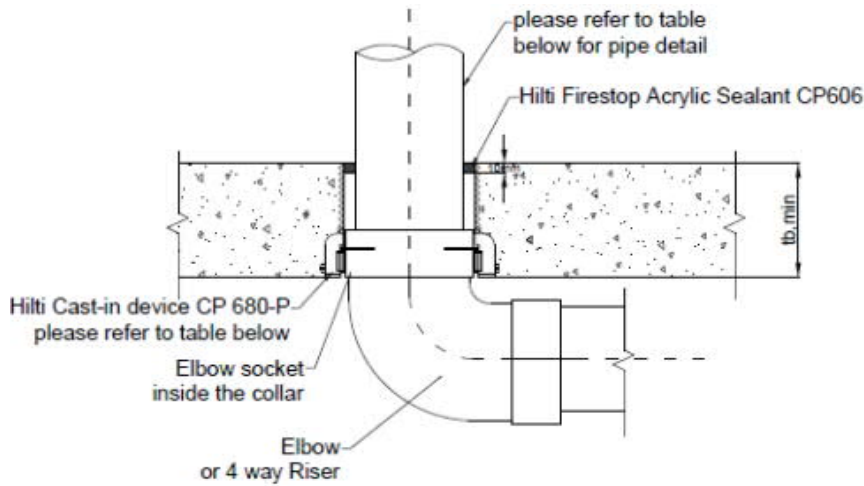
HDPE pipe with elbow inside with sleeve cut flush
